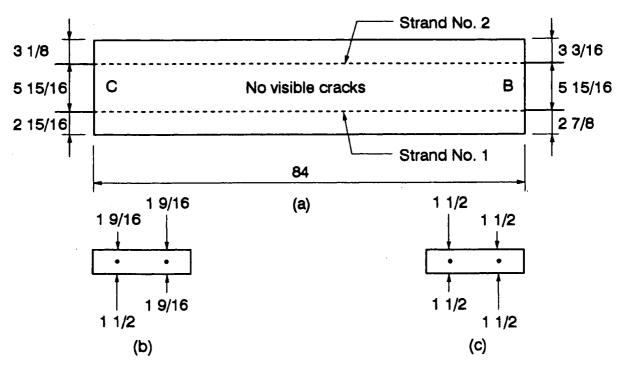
Specimen No. 4-3.0TC-4 (dimensions shown in inches): (a) plan view; (b) end view at C; (c) end view at B
